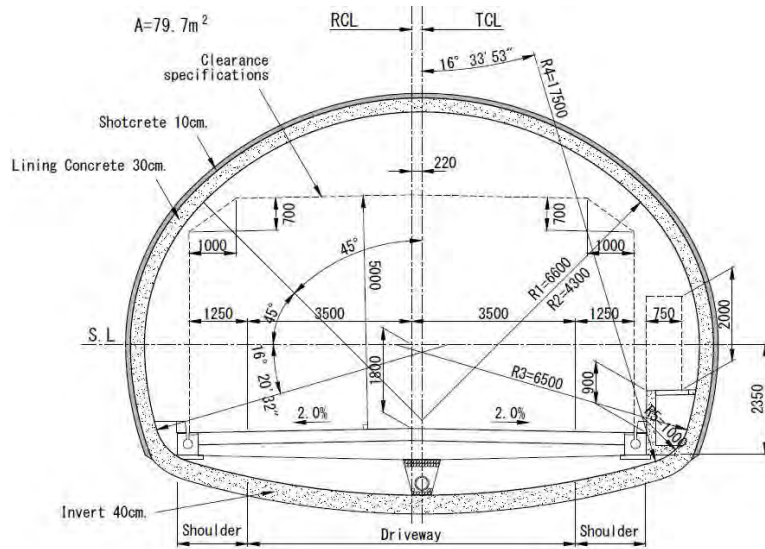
PROPOSED DAVAO CITY BYPASS TUNNEL CROSS SECTION
